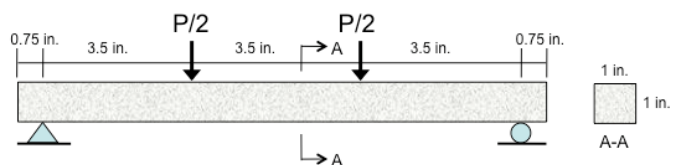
Beam Specimens (1 in. = 25.4 mm)
